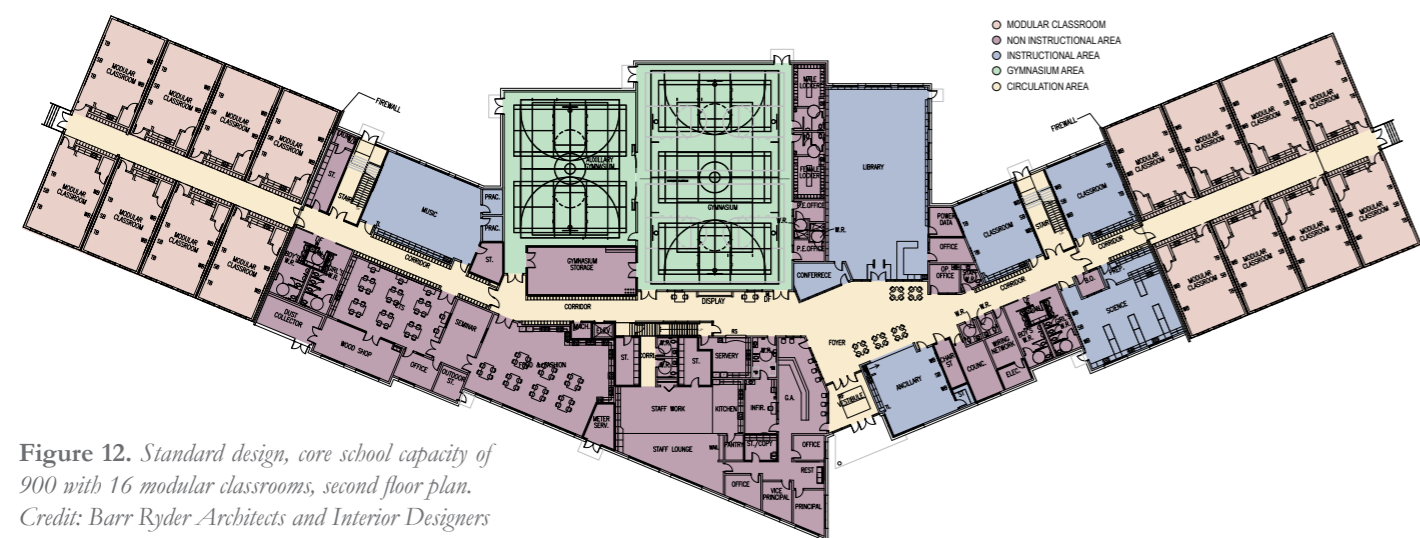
Standard design, core school capacity of 900 with 16 modular classrooms, second floor plan. Credit: Barr Ryder Architects and Interior Designers
